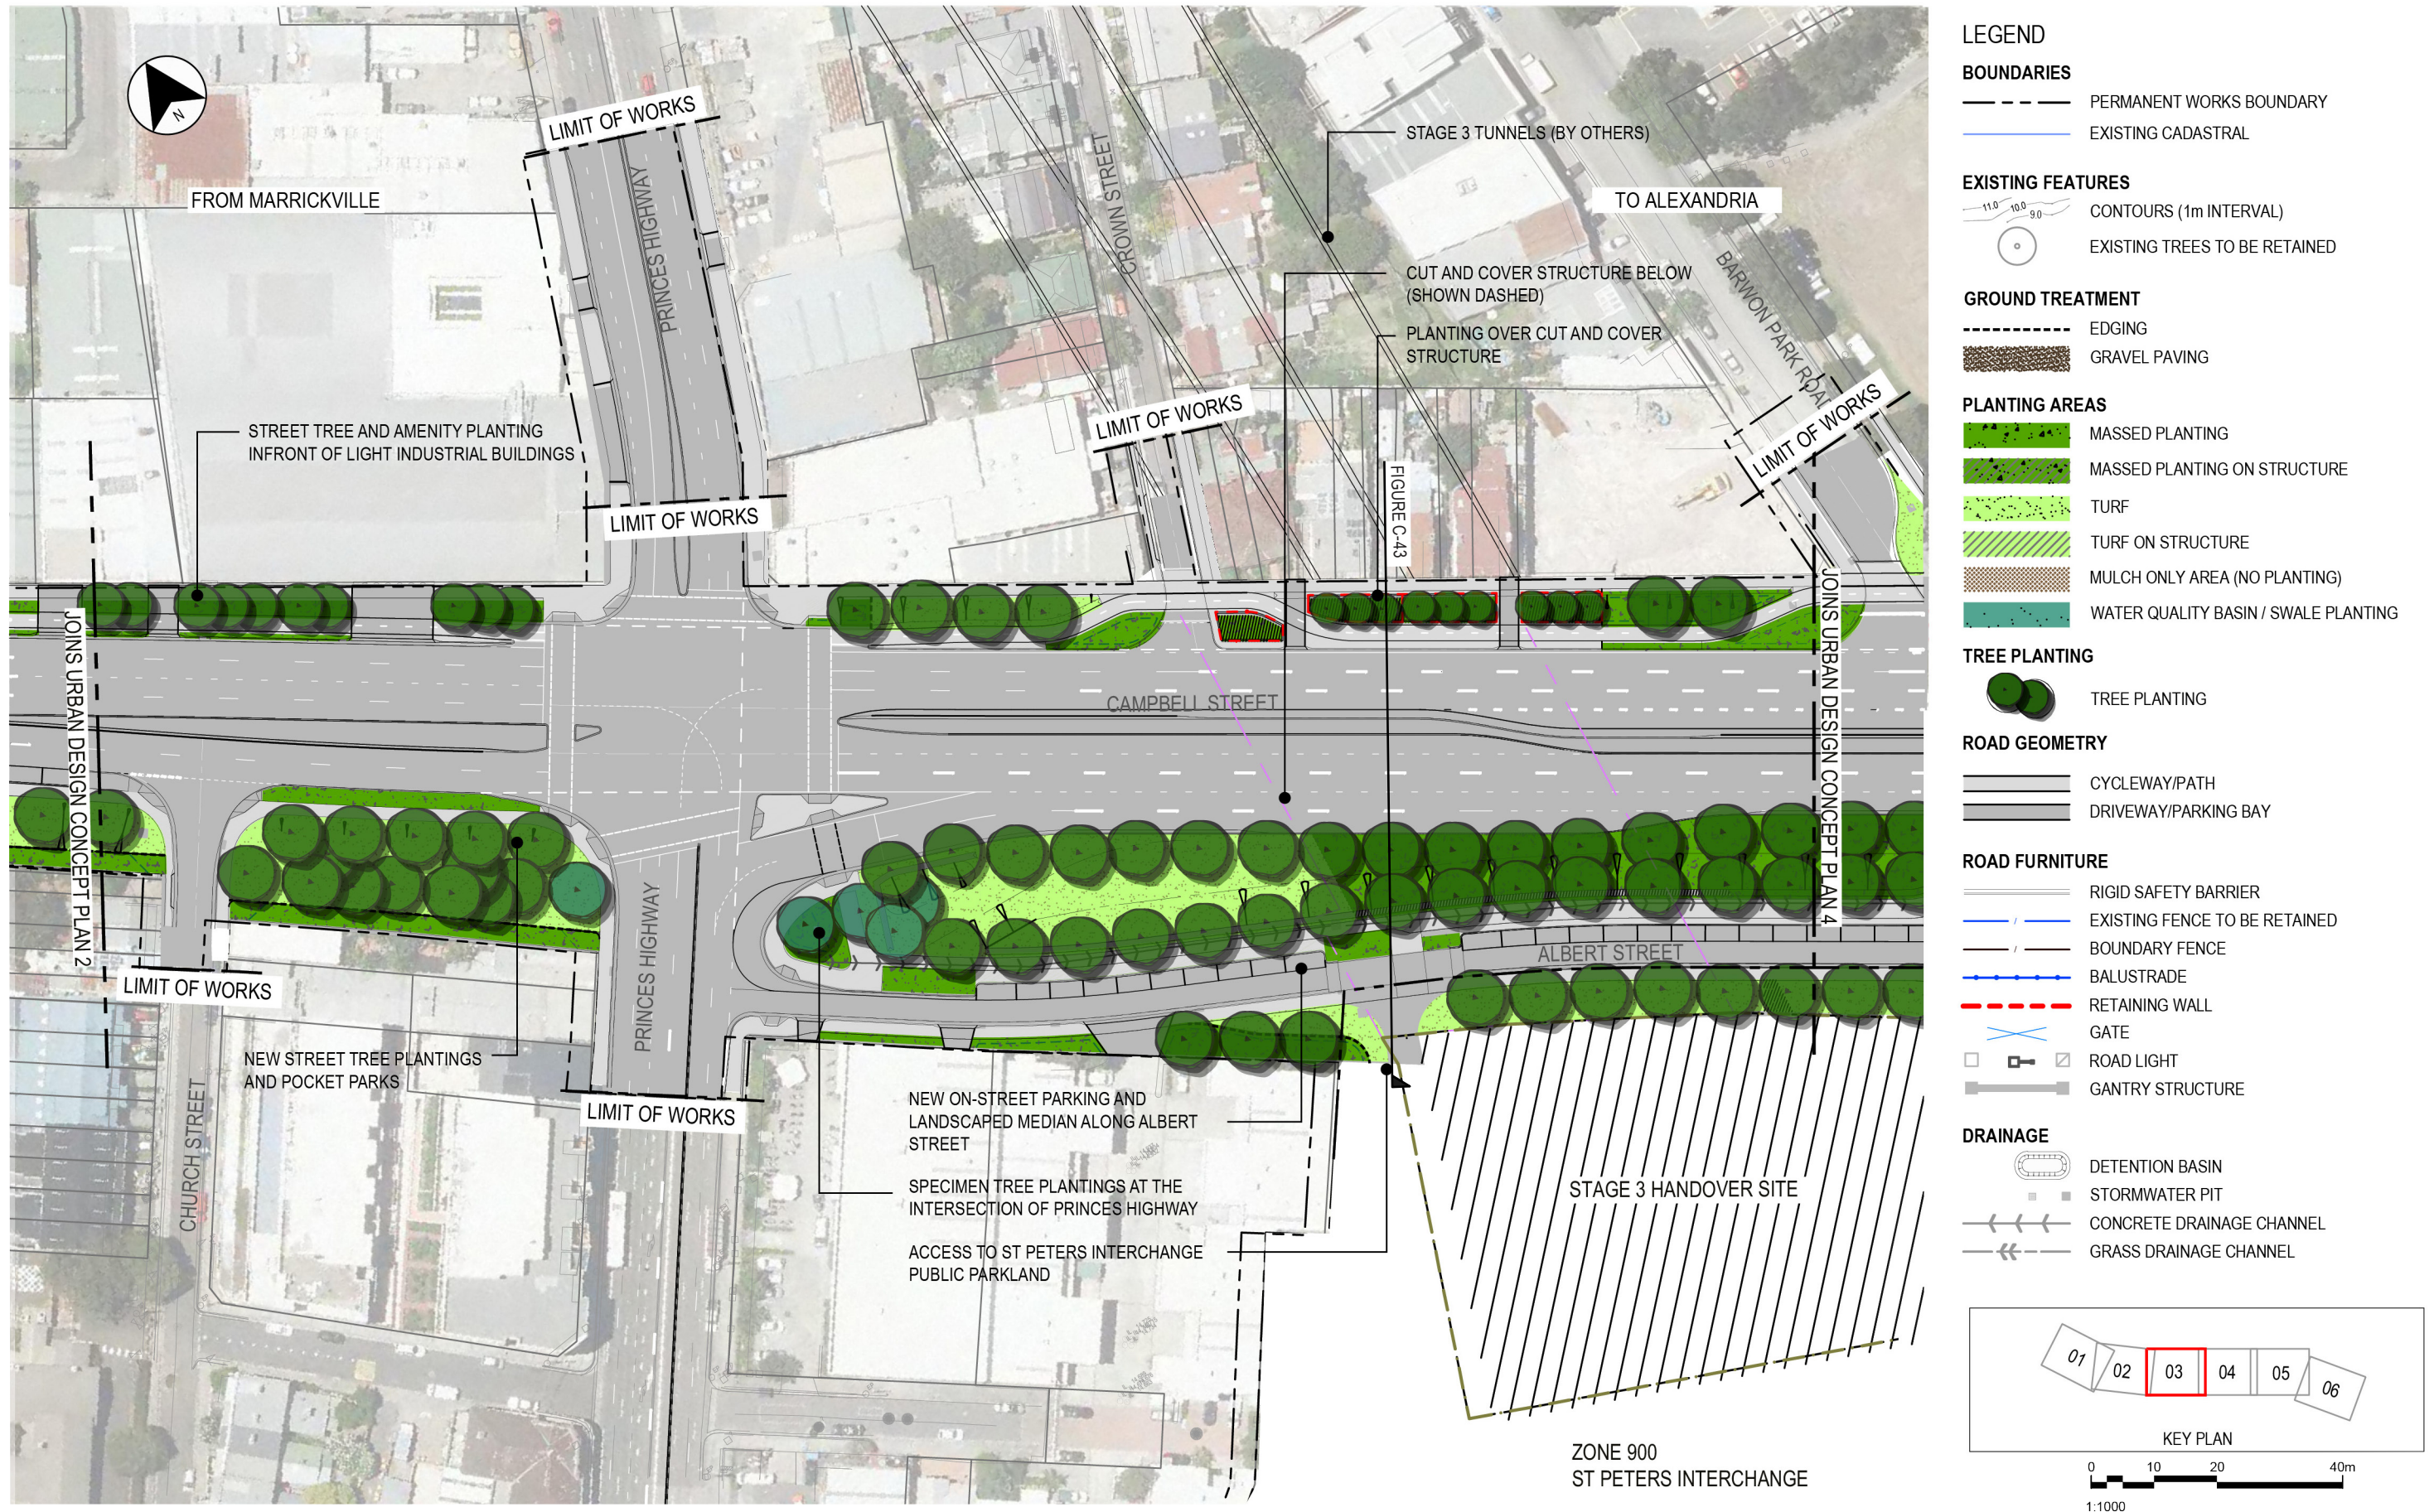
Campbell Street Green Link - Urban Design Concept Plan - Campbell Street / Campbell Road - Sheet 1 of 6 - 1:1000
